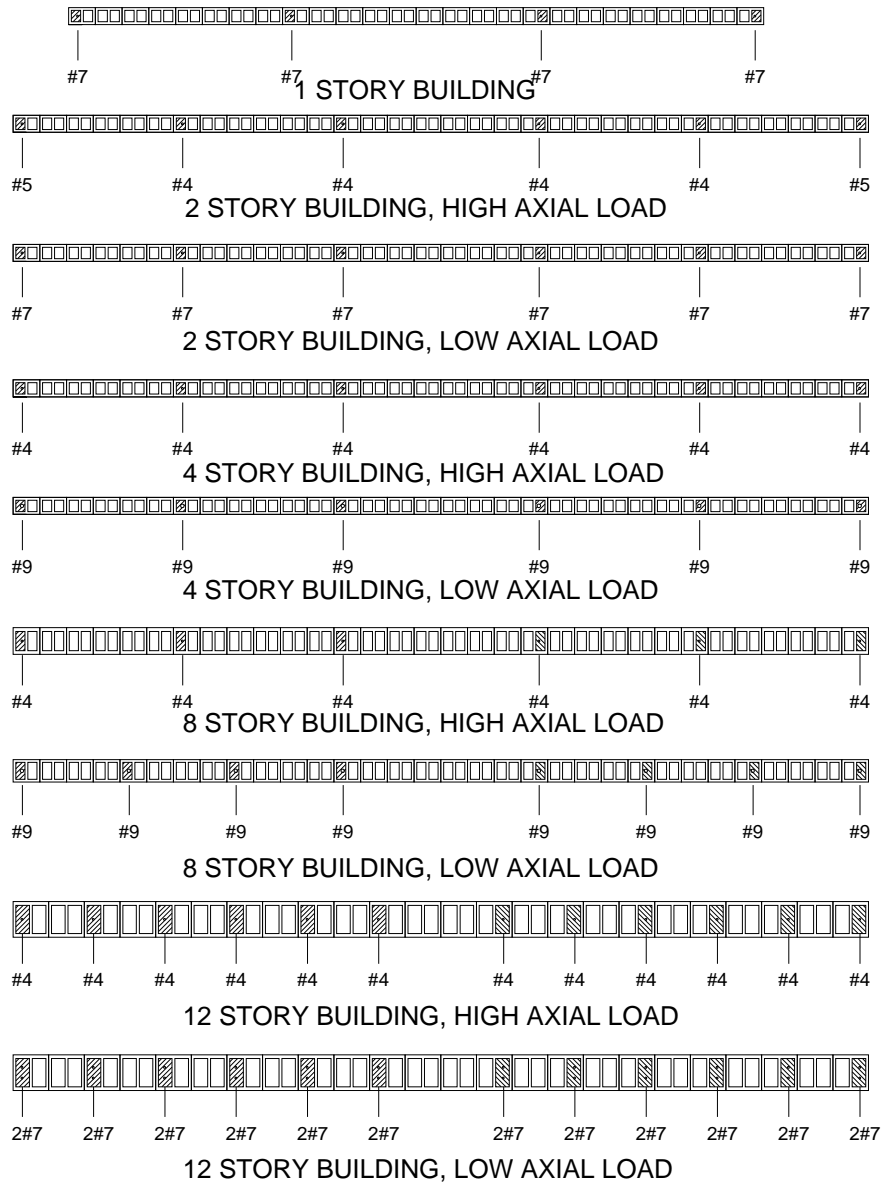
Plan sections of partially grouted ordinary reinforced masonry shear walls, SDC  $C_{min}$ .
